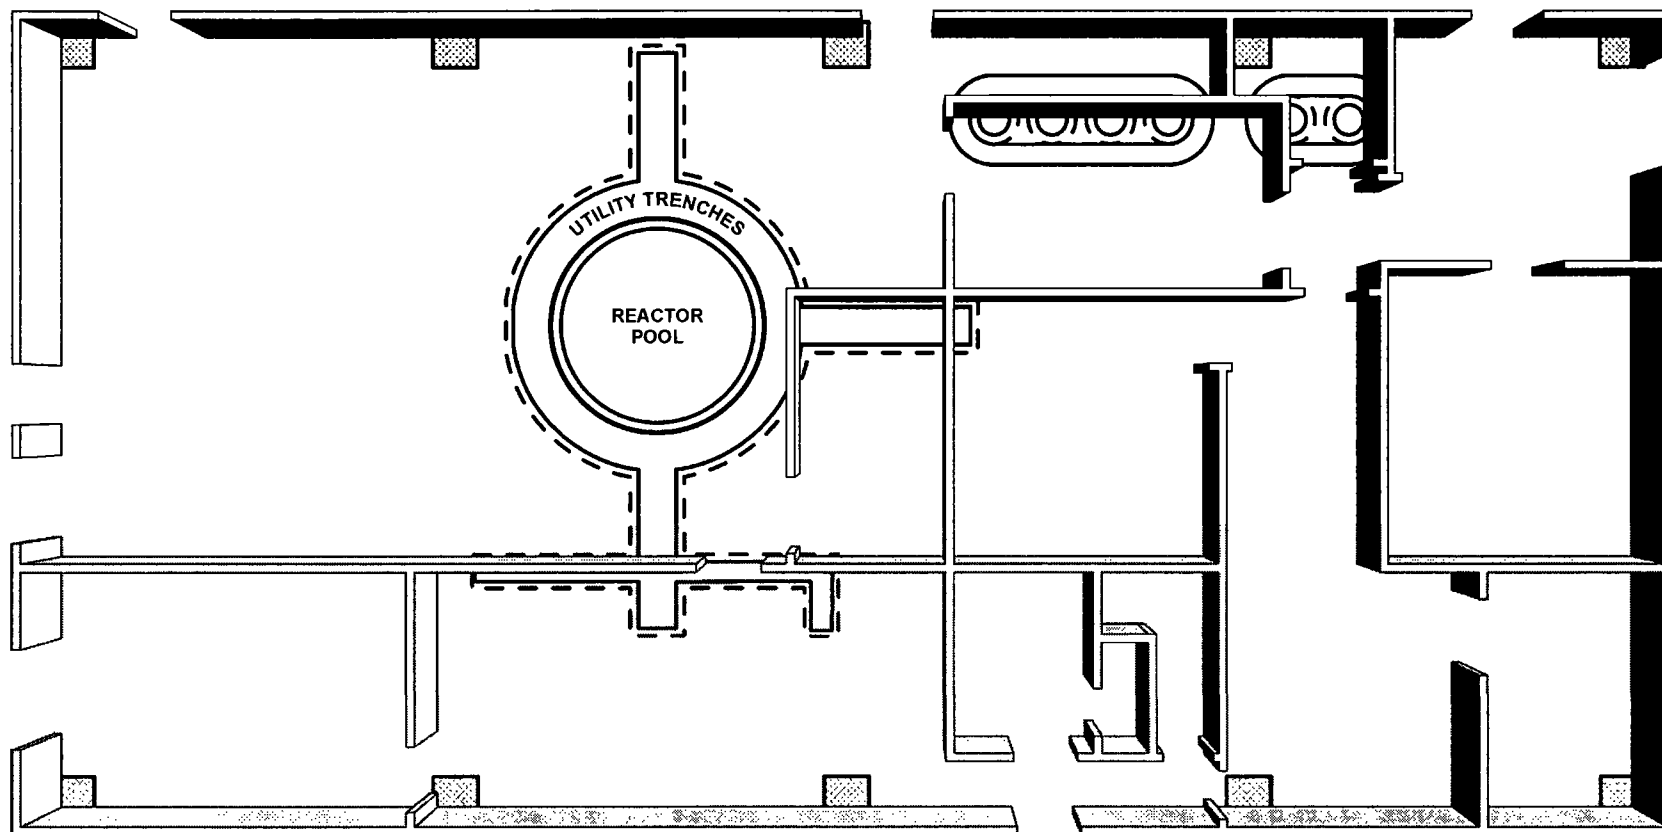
Plan Layout of ARRR High Bay Reactor Building
